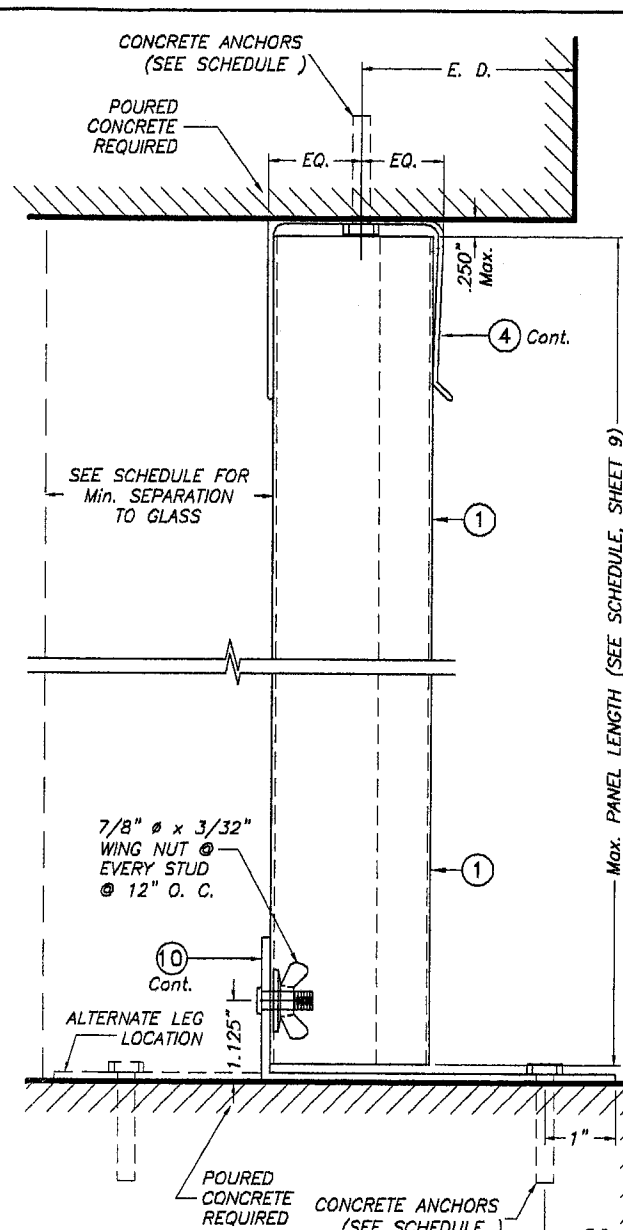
INSTALLATION OF 1/4" x 1" SIDEWALK BOLTS @ REMOVABLE PANEL
